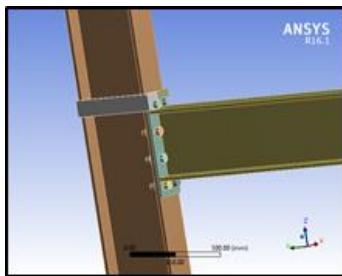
ANSYS model of beam column joint with wing plate stiffeners at bottom
